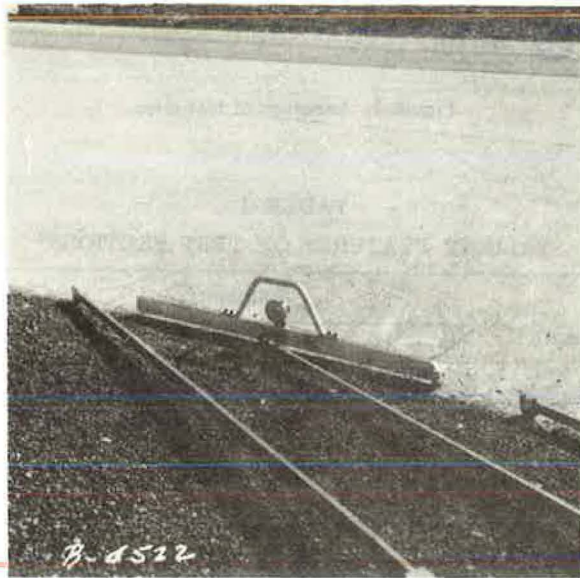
Basin beam and Benkelman beams as used on overnight studies.
